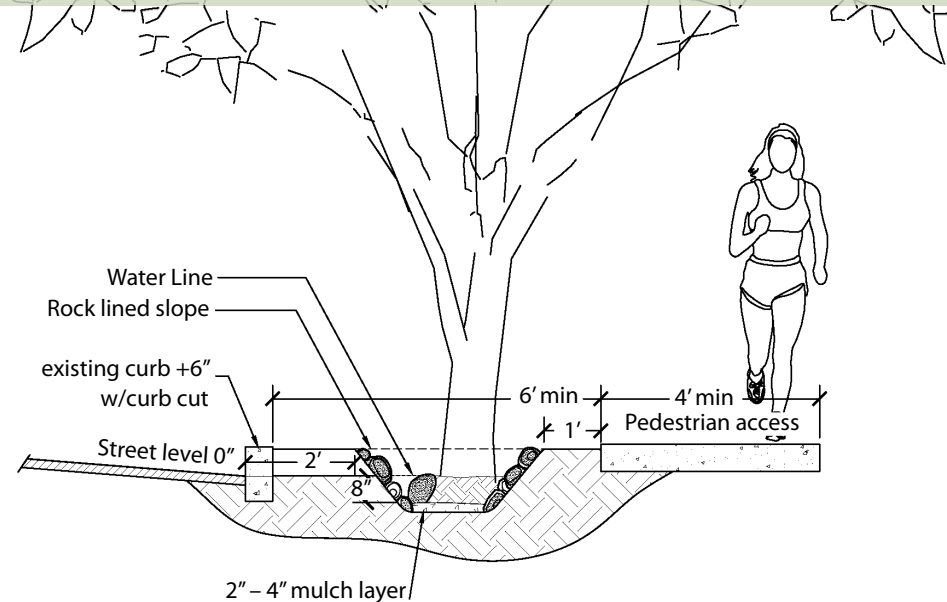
Section A. Typical cross-section of a basin with rock-lined edges, showing typical setbacks for a site on a residential street with on-street parking. For plan view, see Appendix.
